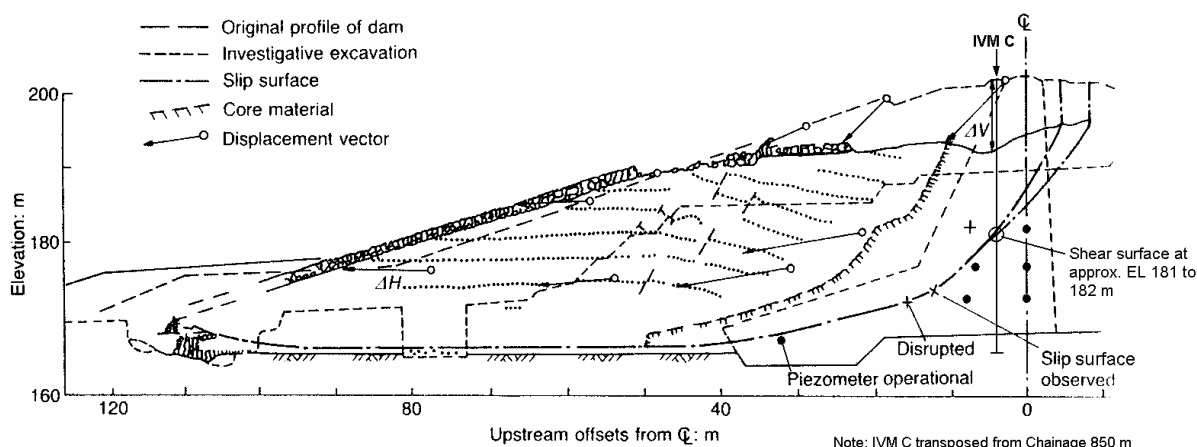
Carsington dam, section at chainage 825 m after failure (adapted from Skempton and Vaughan 1993).
